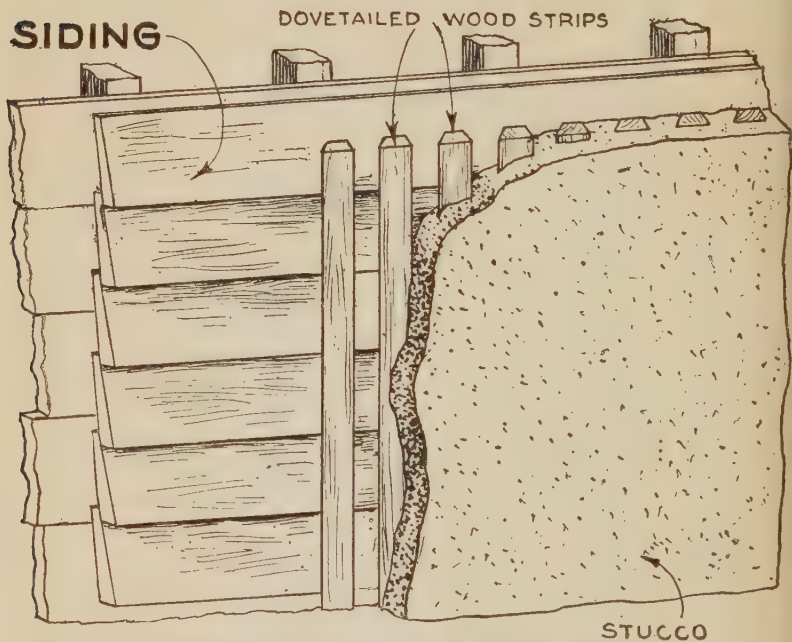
,097.—Stucco applied to old frame building. 1, as placed over siding.
